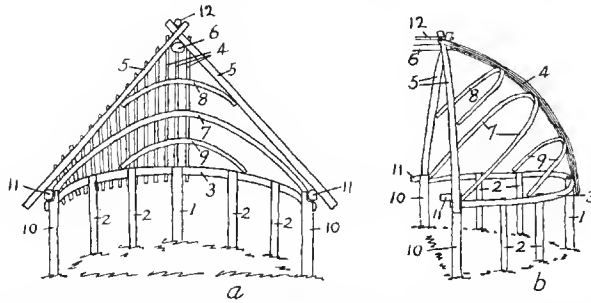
Rounded end section of dwelling house (*fale o'o*): *a*, end view from within; *b*, side view: 1, end wall post; 2, two intermediate reinforcing posts; 3, curb plate; 4, thatch rafters; 5, end rafters of middle section; 6, ridgepole; 7, curved purlin (*fau tu*); 8, top purlin; 9, bottom purlin; 10, middle section wall posts; 11, wall plate; 12, upper ridgepole.
